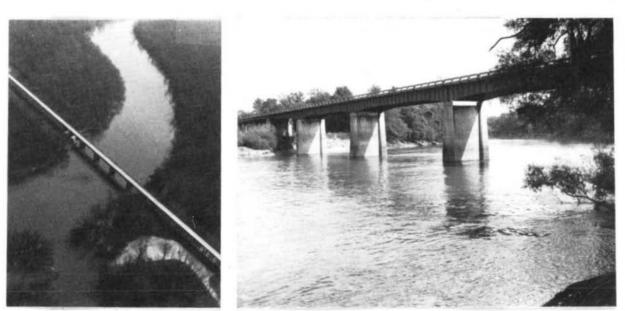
S. C. 34 HIGHWAY BRIDGE (R.M. 116.1)
